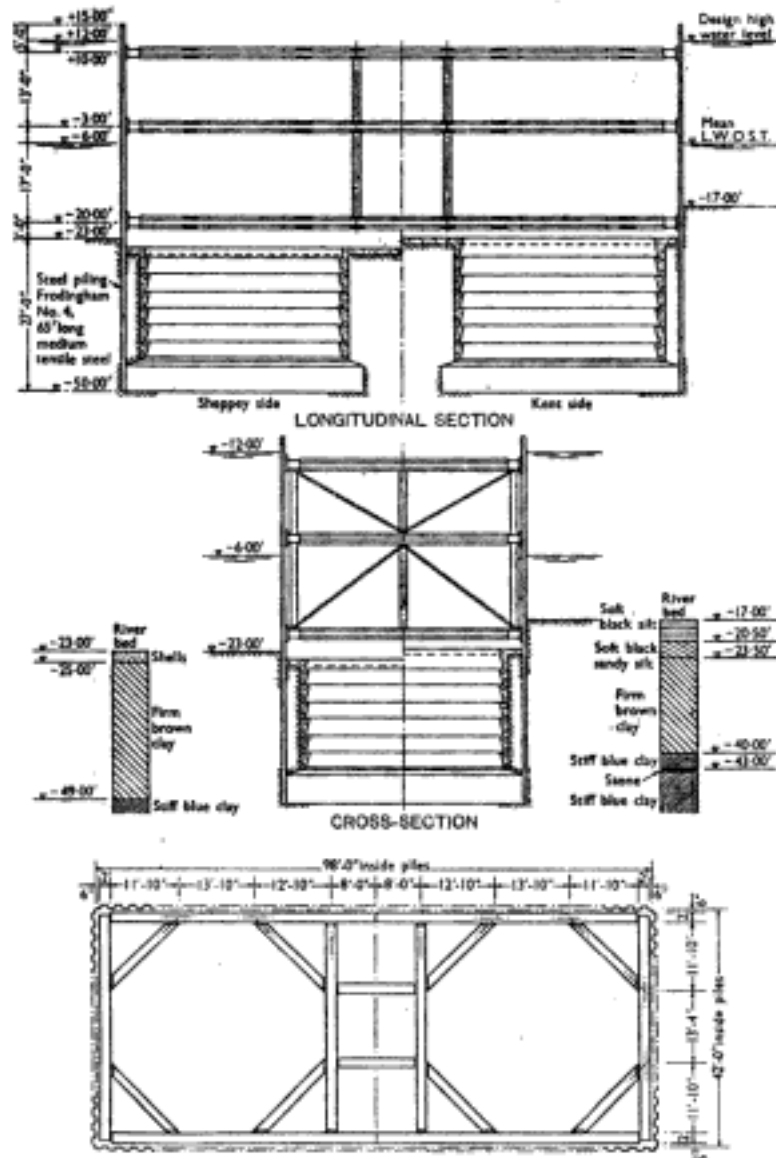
PLAN OF COFFERDAM FOR MAIN PIERS, KINGSFERRY BRIDGE
